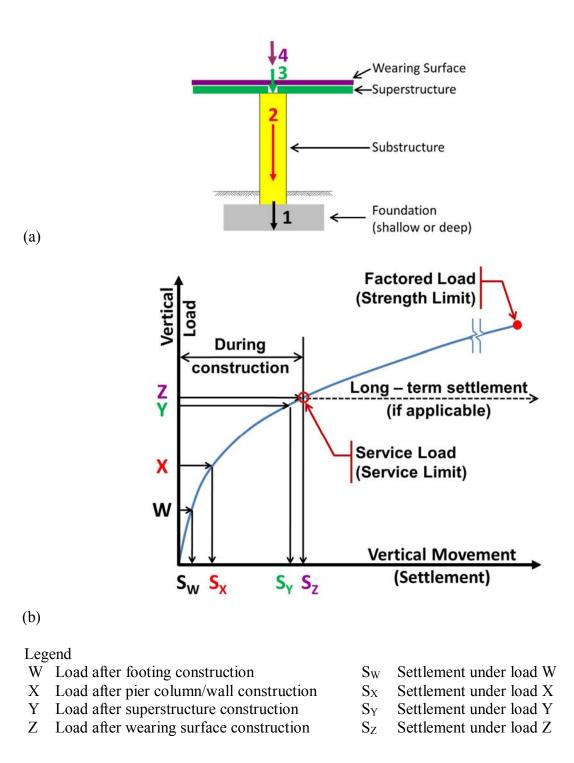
Schematic. Construction-point concept for a bridge pier, vertical loads, and vertical movement (settlement). (a) Identification of critical construction points, (b) Conceptual load-displacement pattern for a given footing width.
